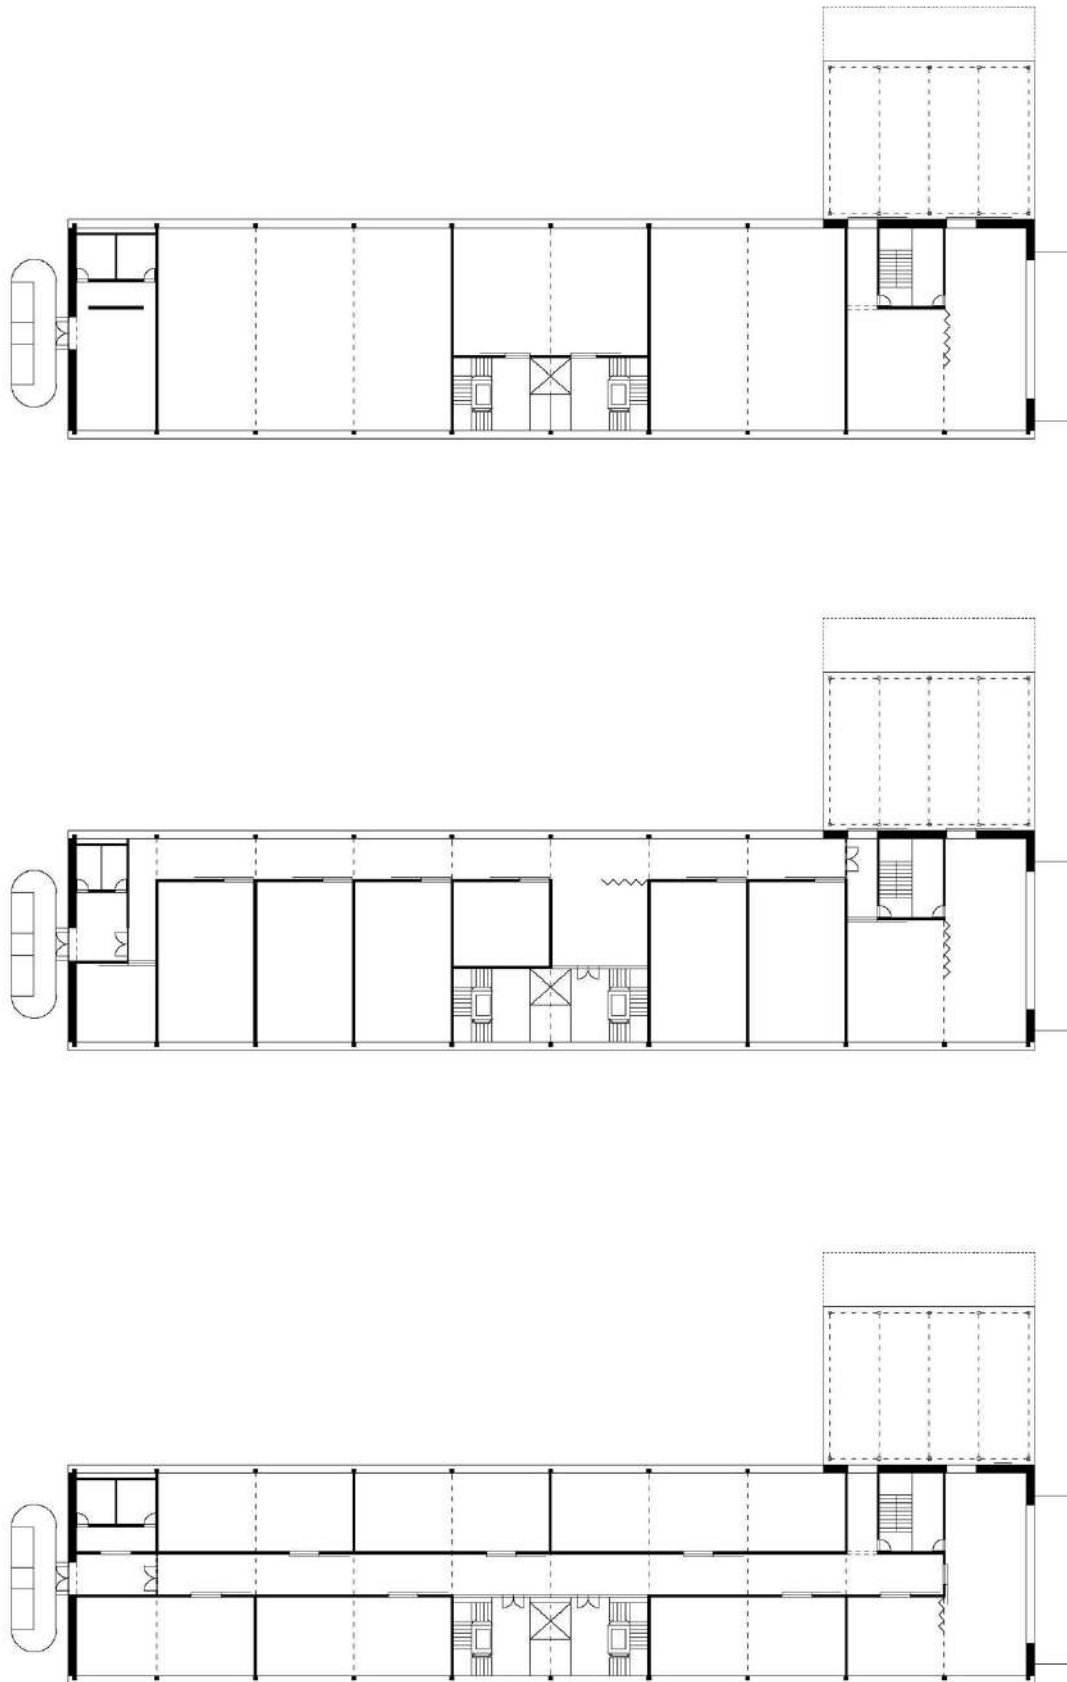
Roof extension - variants for floor plan organisation. Authors: PLURAL
